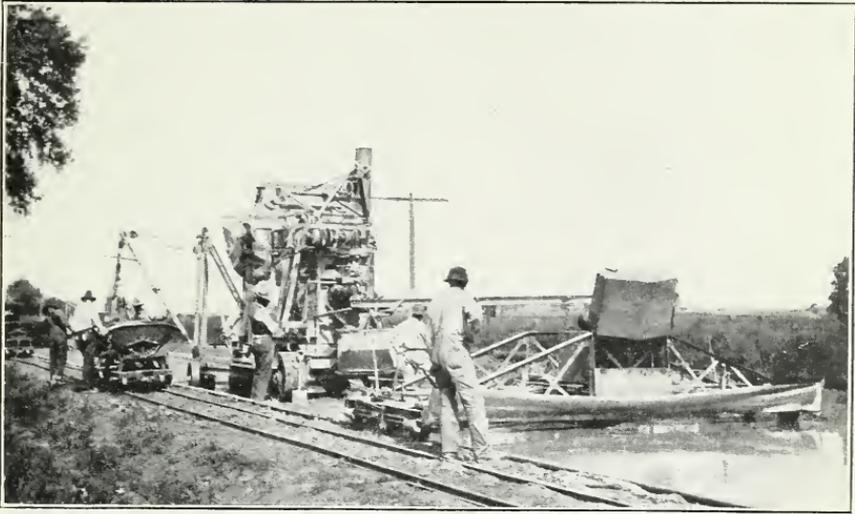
MIXING AND FINISHING THE CONCRETE.
